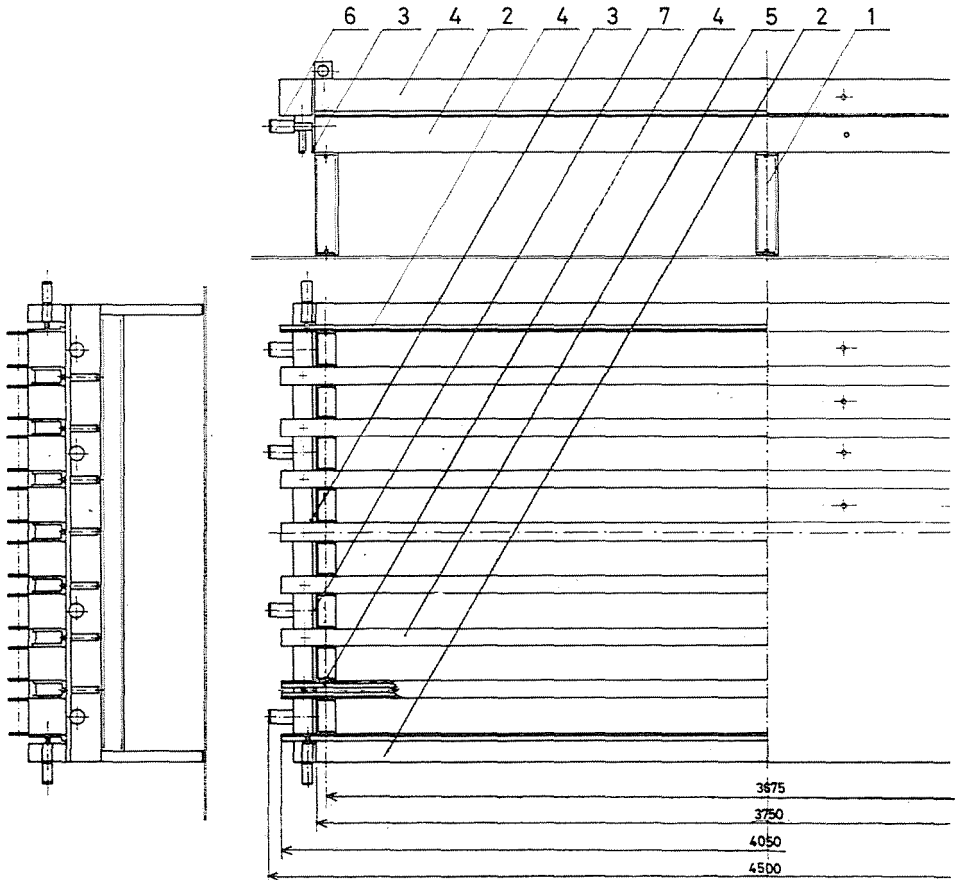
Battery principled manufacture of tectonic beam elements (plane structural elements). Detail. Horizontal and vertical section through the transplatable closing frame. Index: A. periodic gypsum surface element; B. reinforcement; C. ribbed reinforced concrete shell; D. clips, plastic spacers; E. the finished preceding beam element. 1. L-profile edging the manufacturing plane; 2. ear, folded steel U-profile; 3. the transplatable closing frame; 4. graboplast stripes separating the upper and lower flanges of the beam elements
